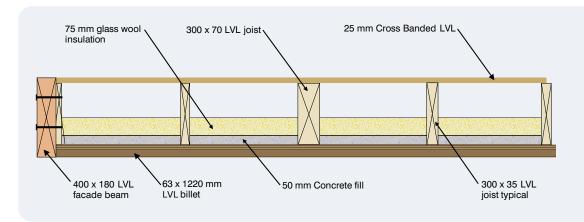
Cross-section of LVL floor cassette with perimeter beam attached.
